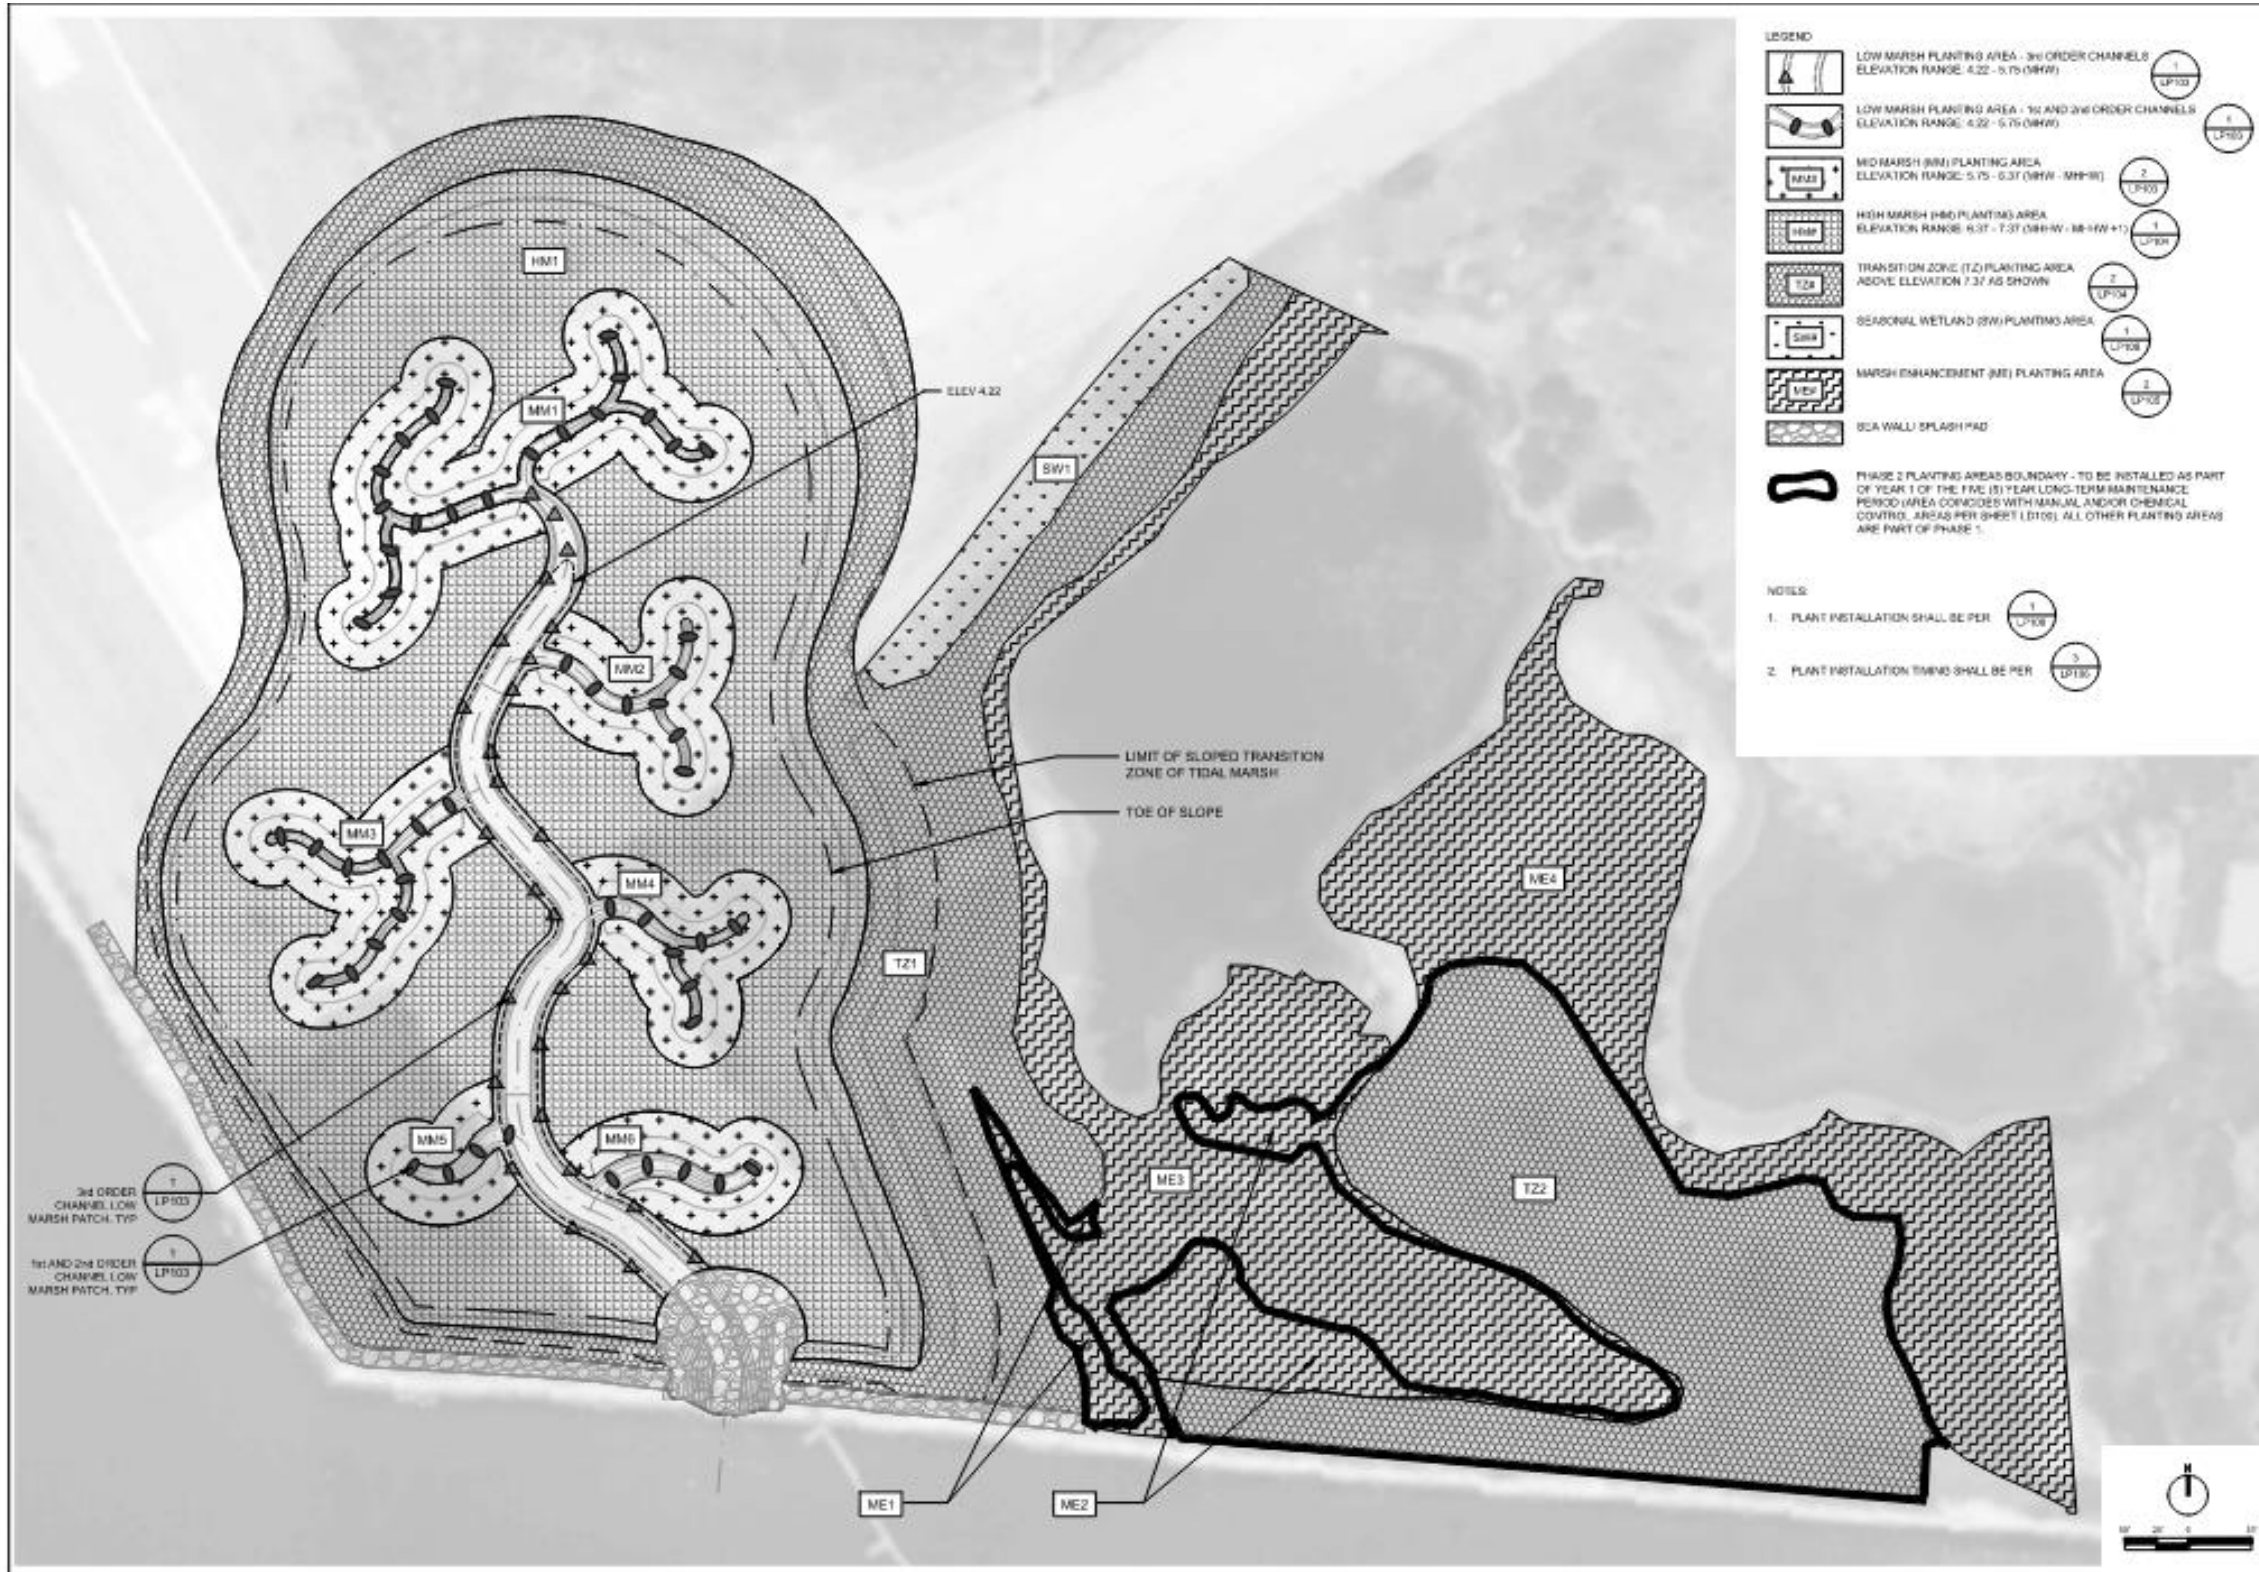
Plan View of a Proposed Wetland Plan View with Planting
